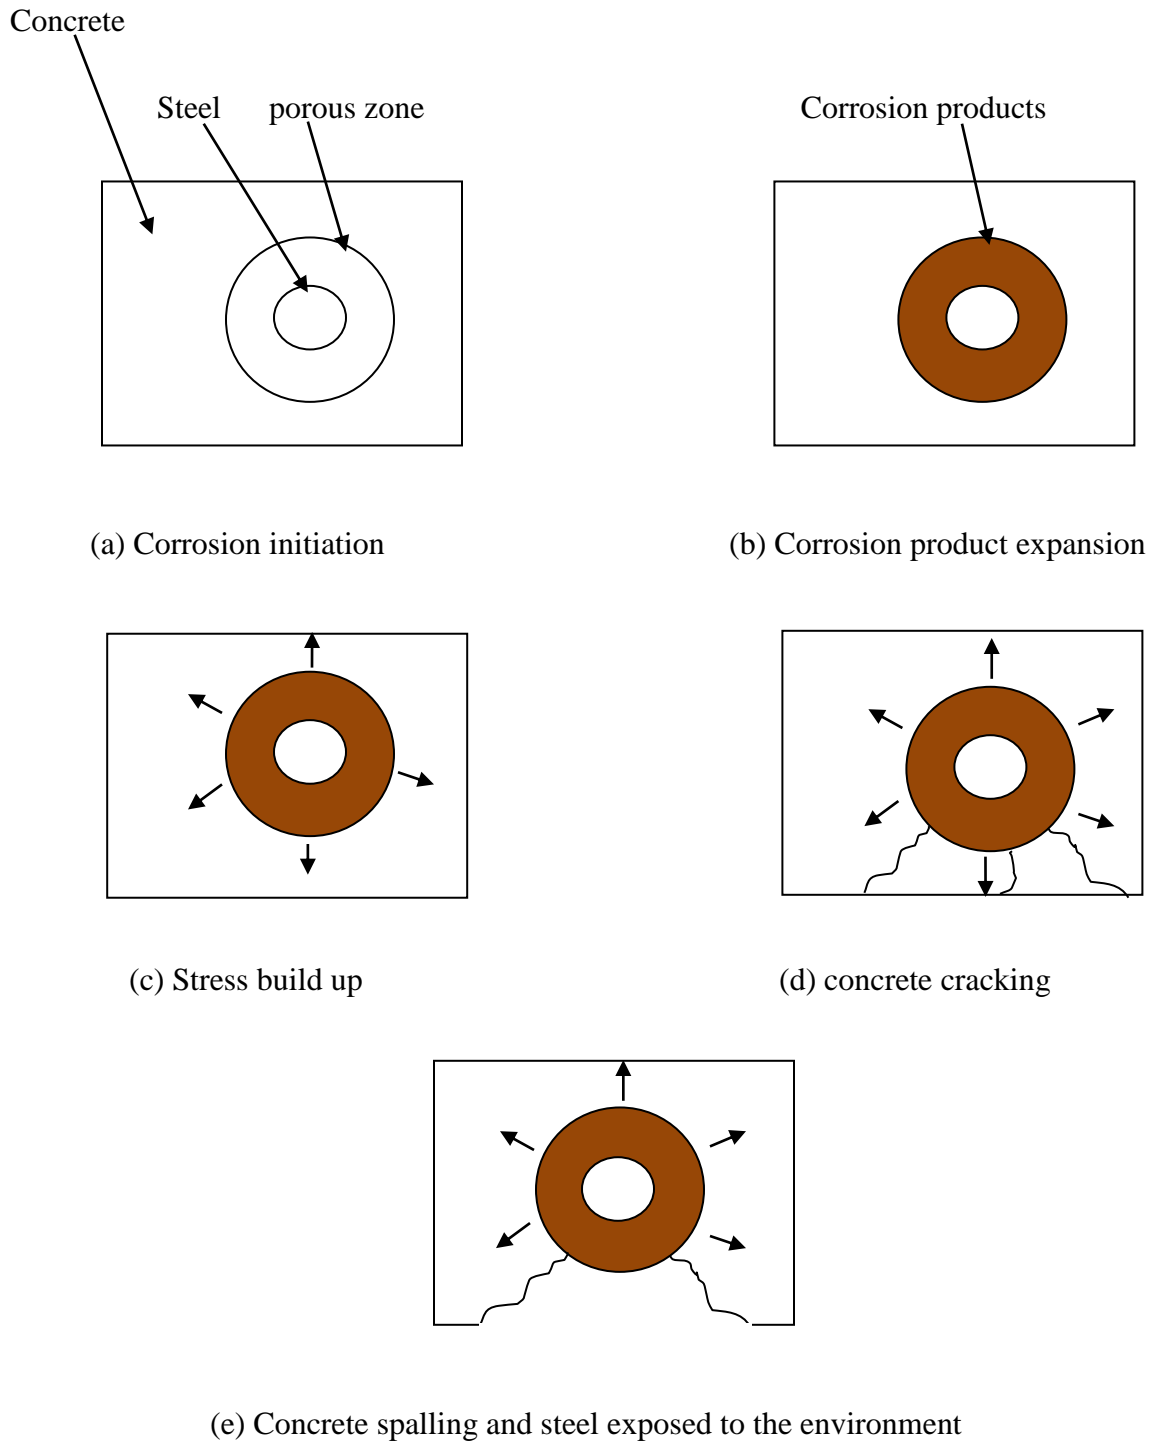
Corrosion and cracking process in reinforced concrete (Weyers, 1998)
